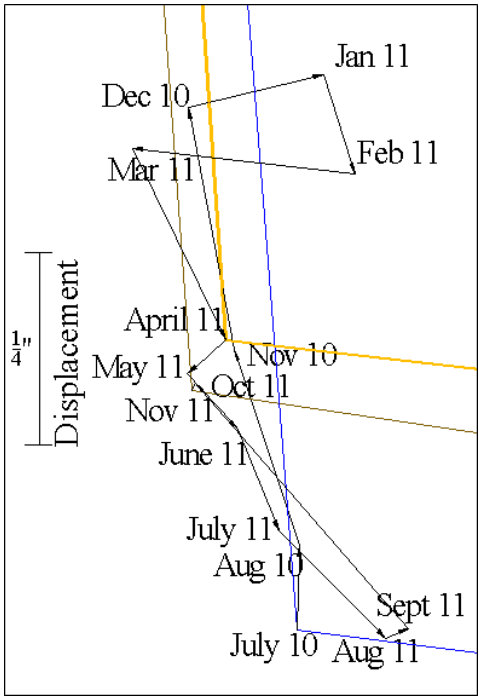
Bridge 109 Movement at south abutment west and east reflectors
